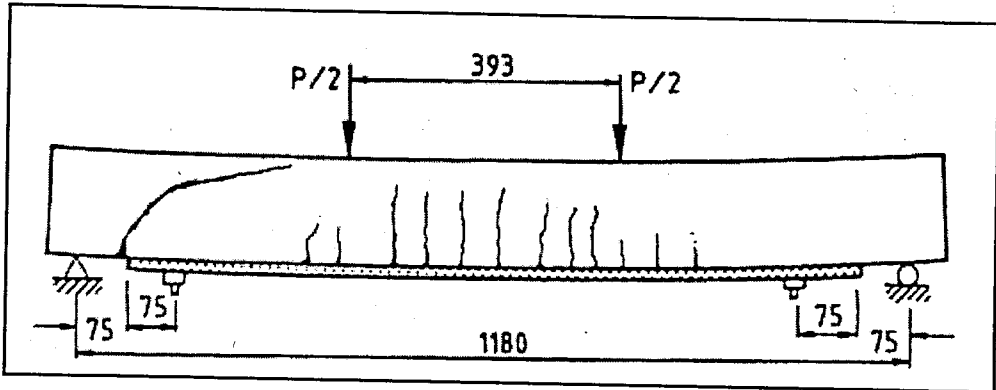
Formation of diagonal tension cracks with steel anchorage bolts [7]
